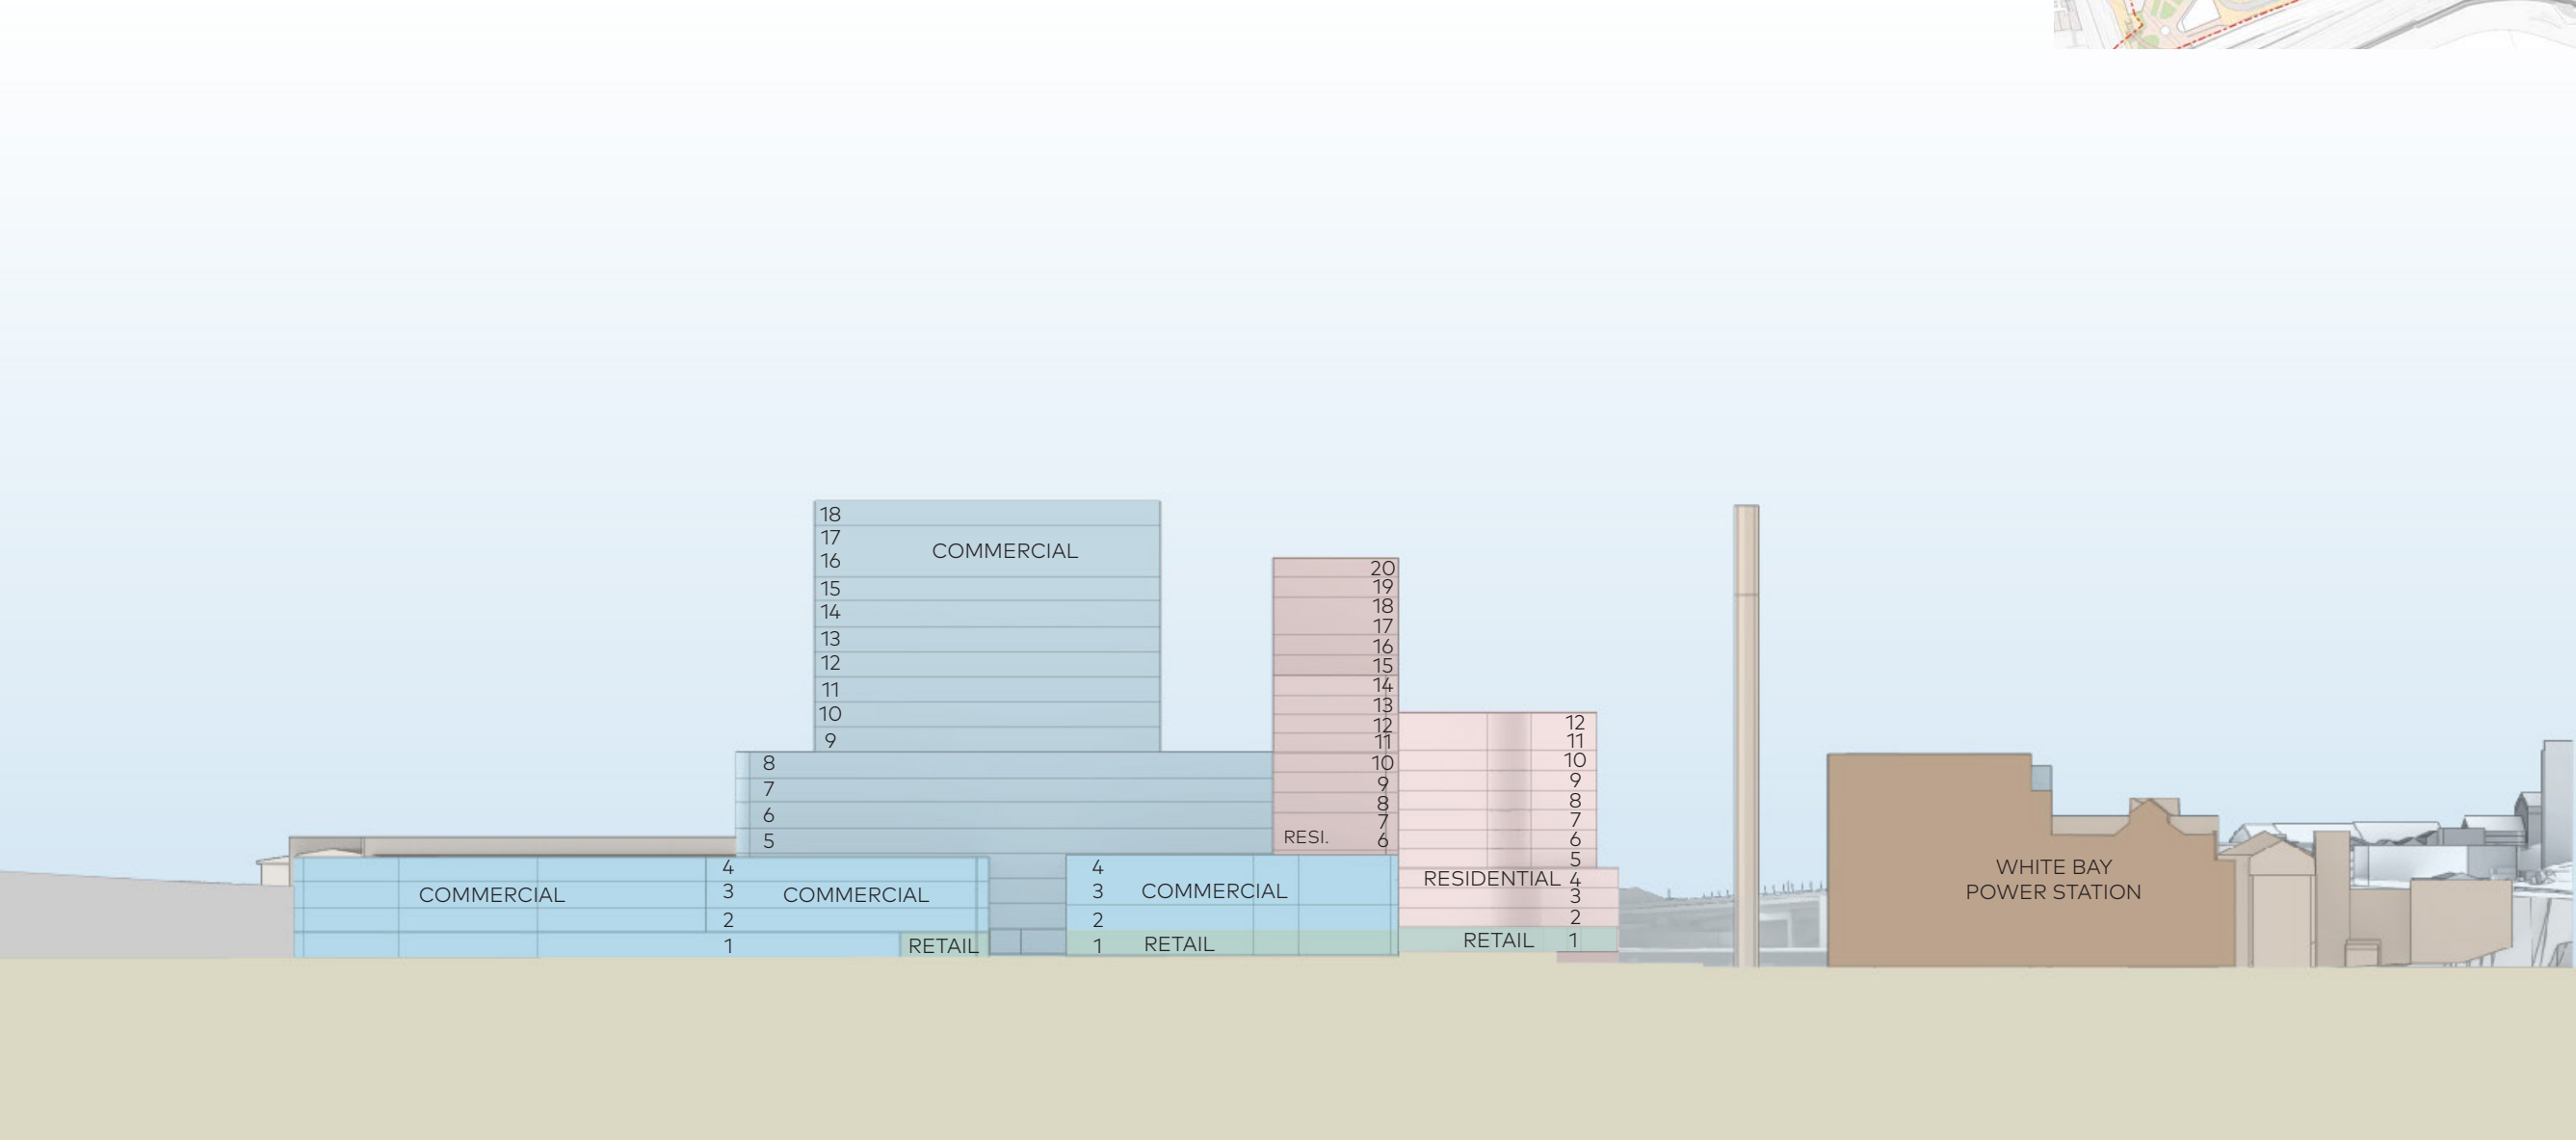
Section looking south through development south of Metro station and White Bay Power Station
